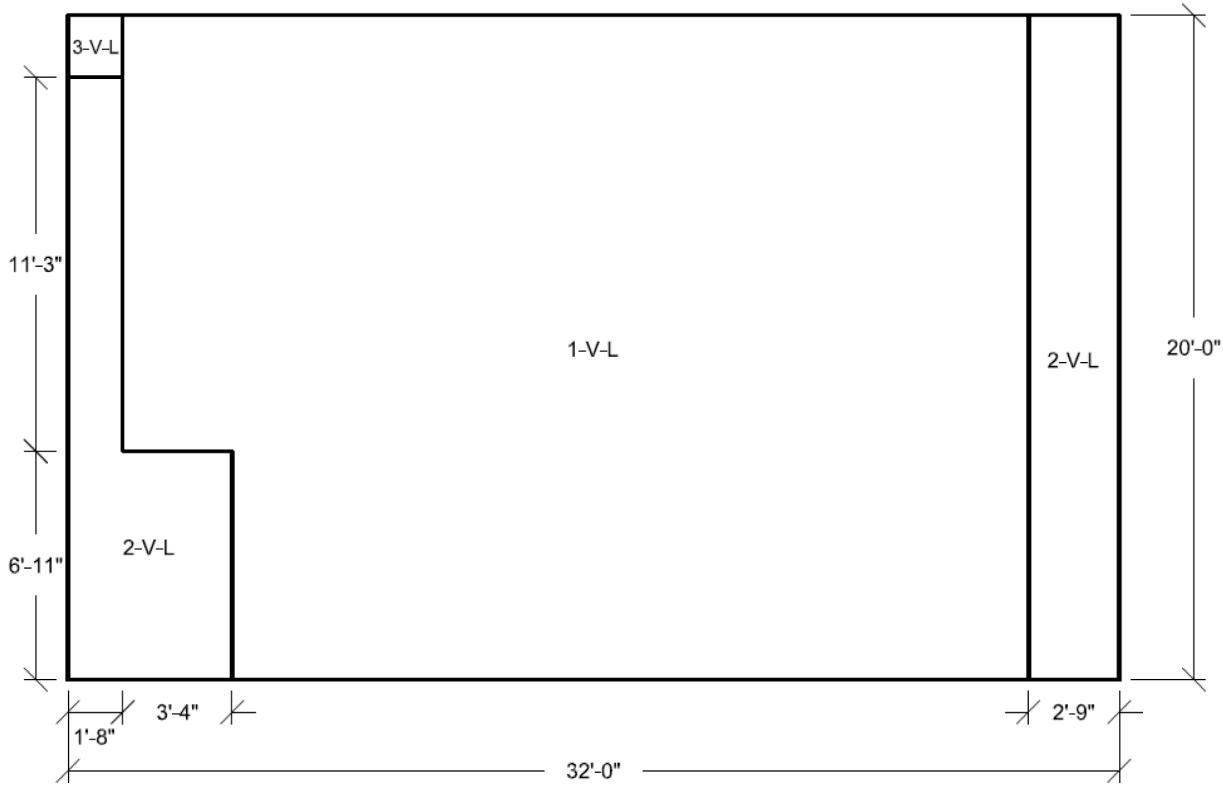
H.6-200 DGFOSV Wall 15 Looking From Outside
